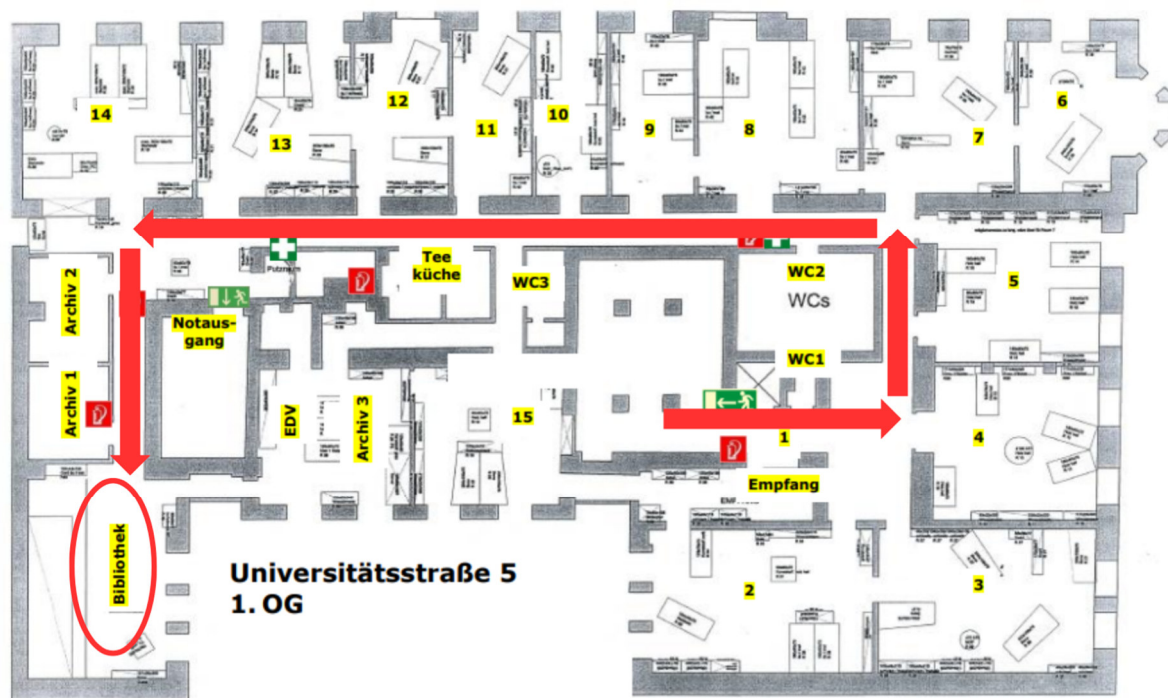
Floor plan of Universitätsstraße 5, 1<sup>st</sup> floor: Library
